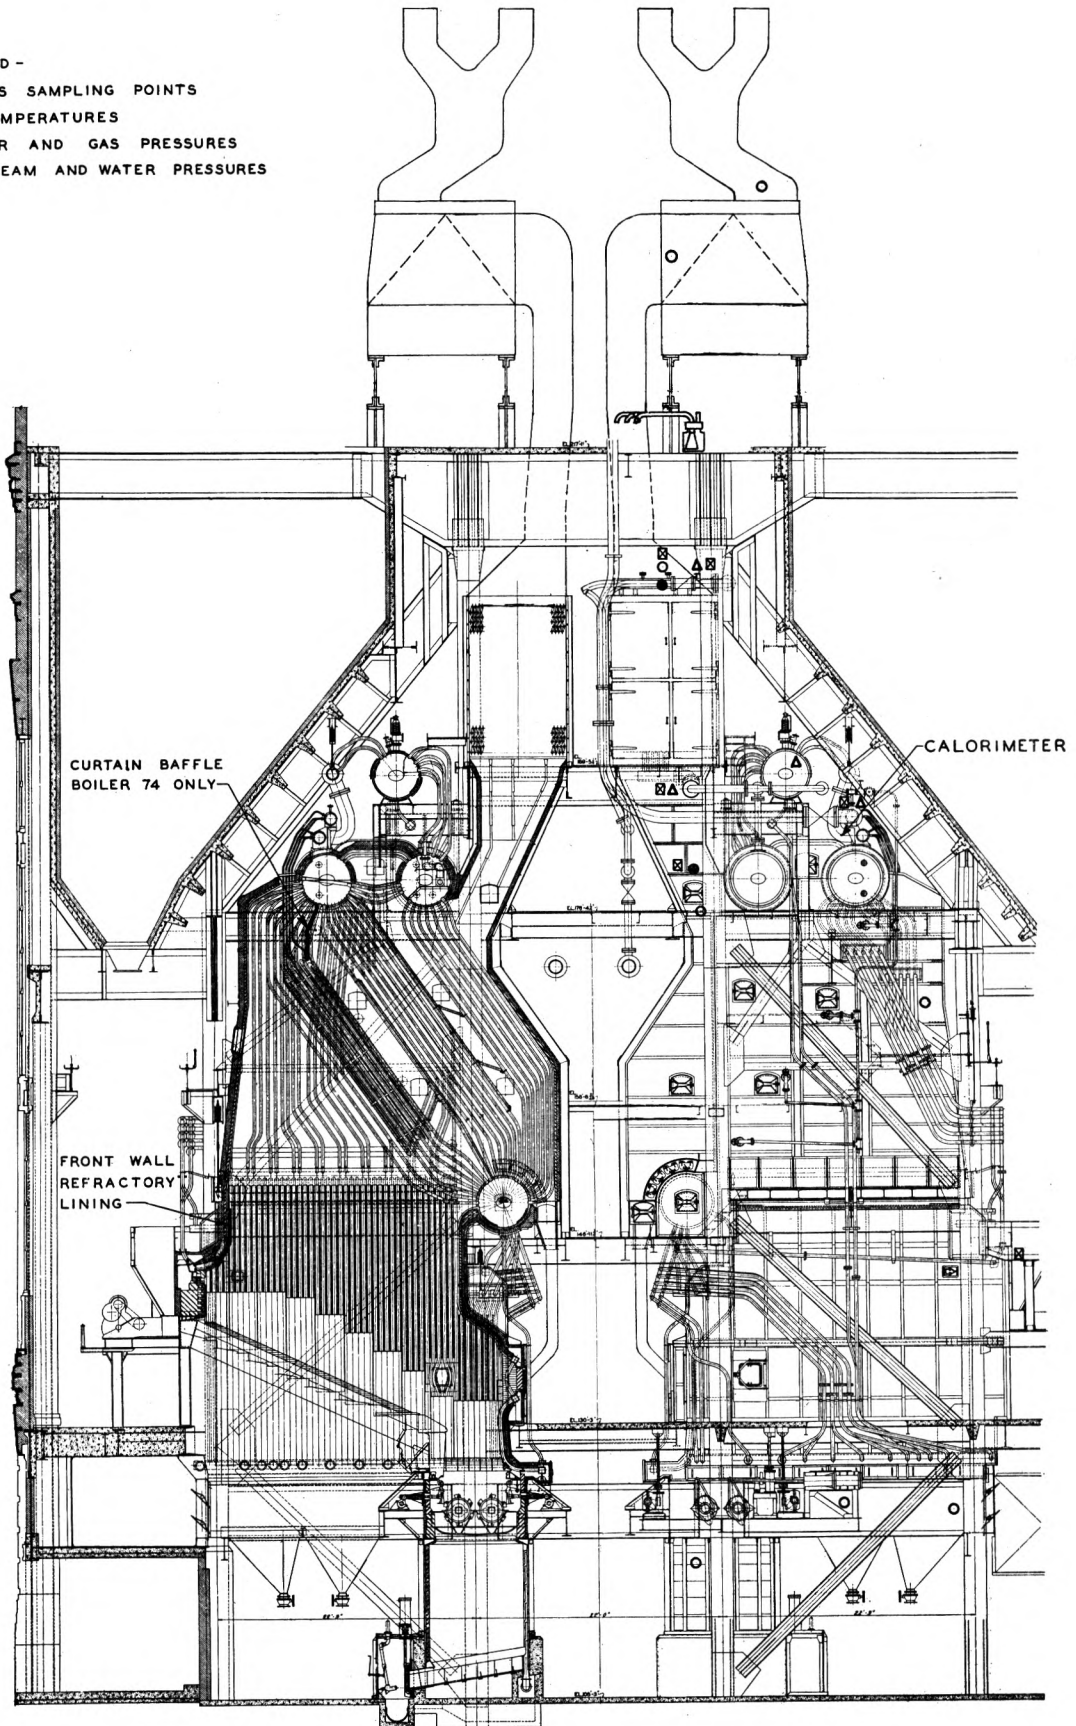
STEAM-GENERATING UNIT SHOWING LOCATION OF TEST INSTRUMENTS
